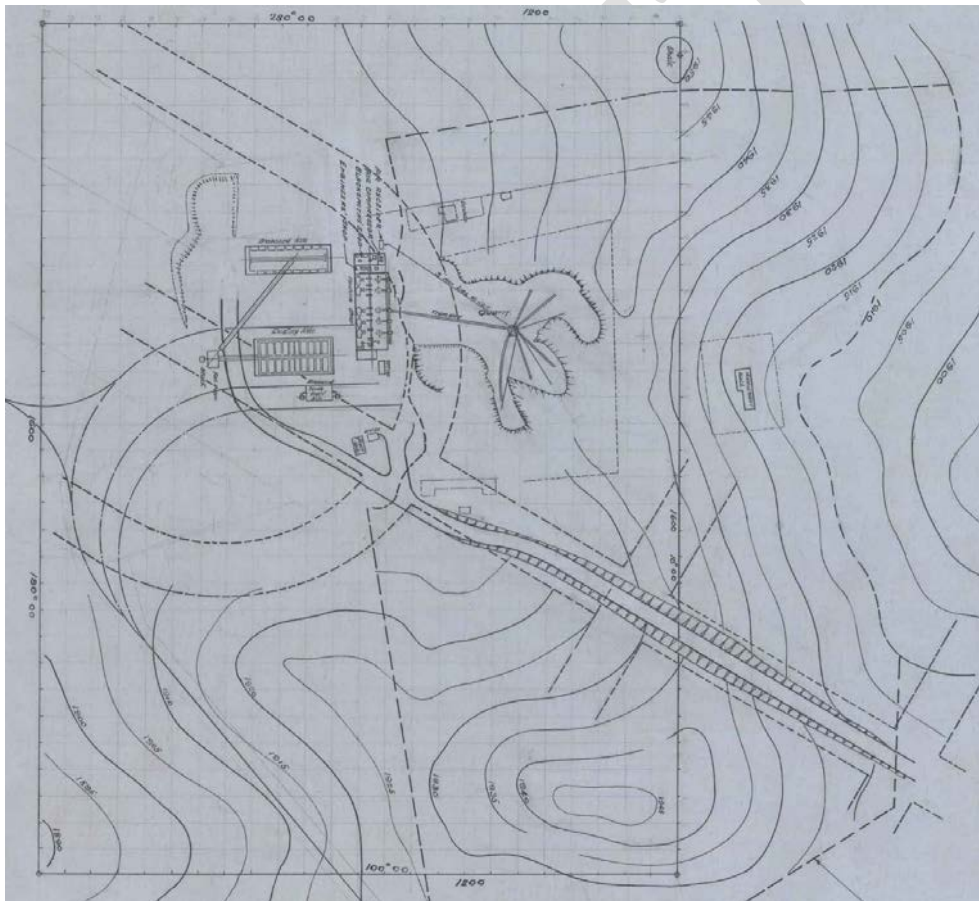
Canberra Brickworks site plan, 1926. North is at top
